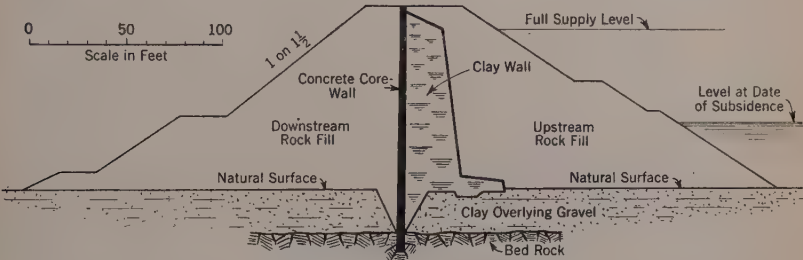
TYPICAL CROSS-SECTION OF EMBANKMENT, EILDON RESERVOIR, AS COMPLETED IN 1927
